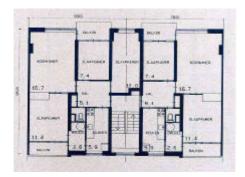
Existing floor plan of flats accessed from a common entrance hall
